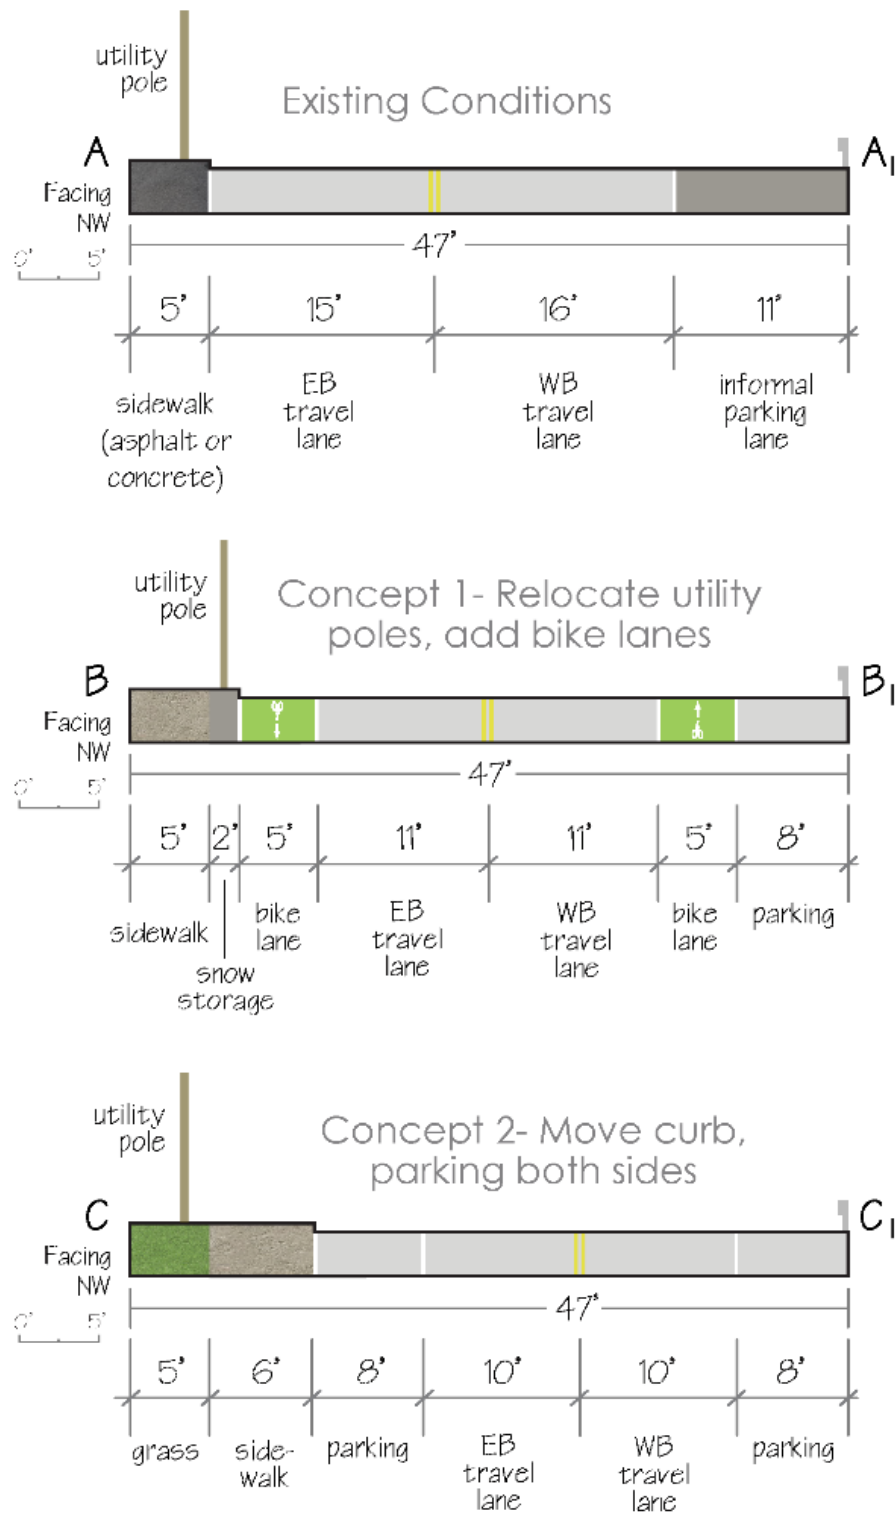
Concept 1 Fayette Street (South Wilbur Avenue to Nelson Street)
